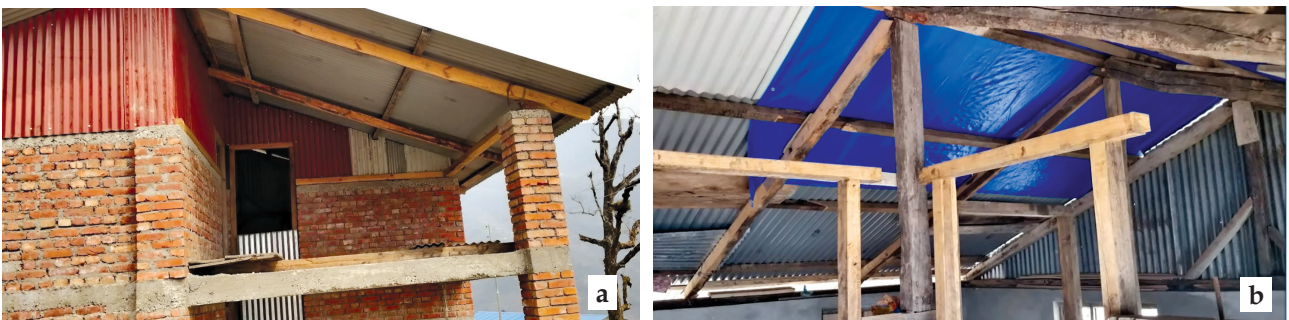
(a) Completed roofing structure, with rafter tied in vertical rebar. (b) Use of old and new timber in roofing structure, vertical rebar left unanchored, and wall in attic constructed only upto 4' height, remaining to be constructed in timber frame and light partition of CGI or timber.
